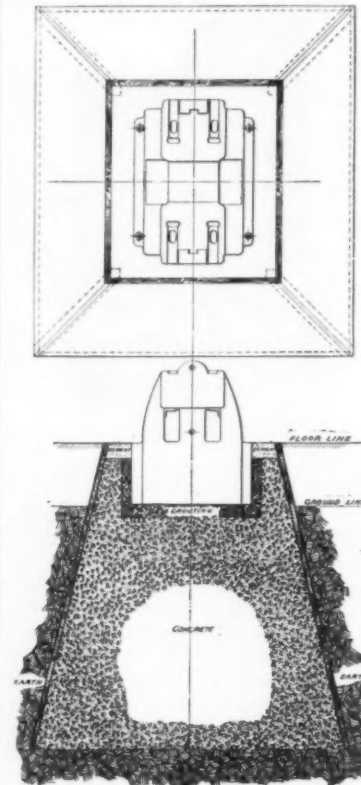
PLAN AND SECTIONAL ELEVATION OF SOLID CONCRETE DROP-HAMMER FOUNDATION.
